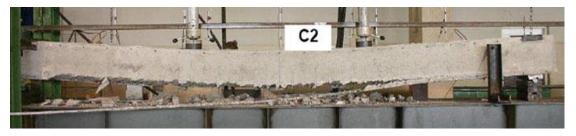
Failure by intermediate crack debonding with adjacent cover concrete [86].
